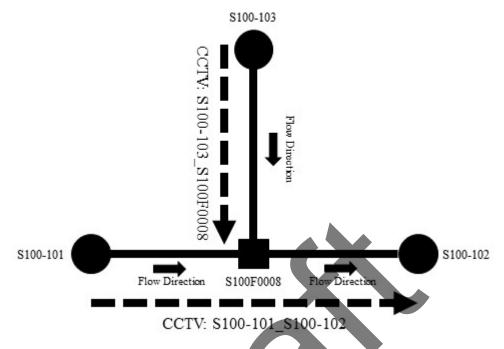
Performing Sewer Pipe Inspections
